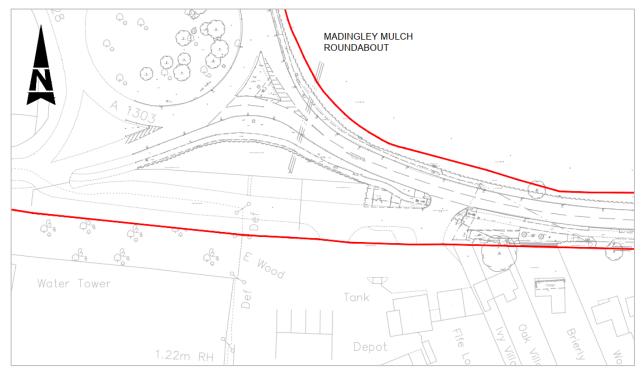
Highway boundary south of Madingley Mulch roundabout – Section A (from TSM © Crown)
